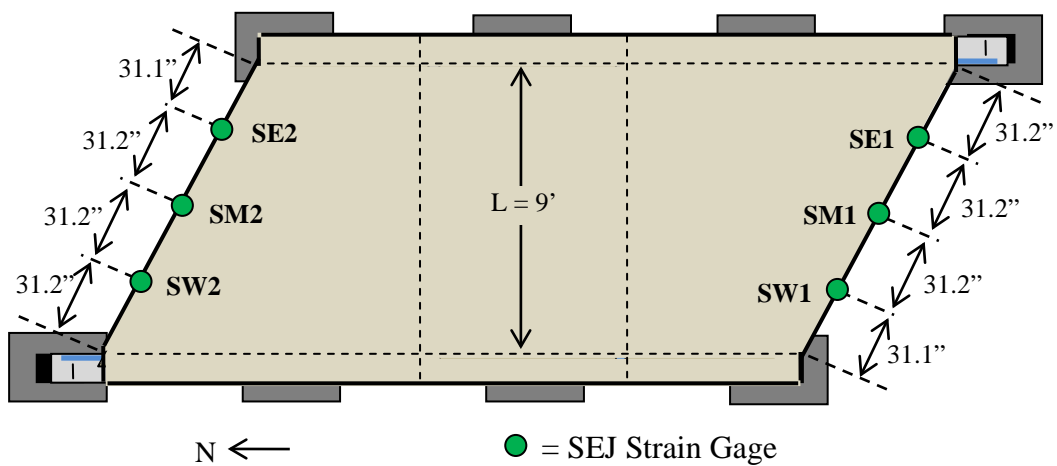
SEJ Strain Gage Locations and Labels for Specimen P30P3
